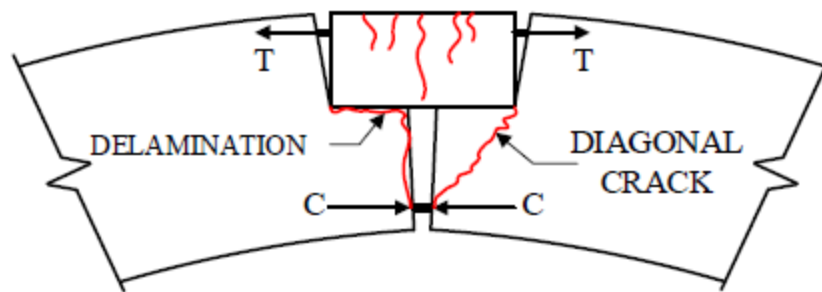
Crack Illustration in the Precast Joint Element (Halbe, 2014)
